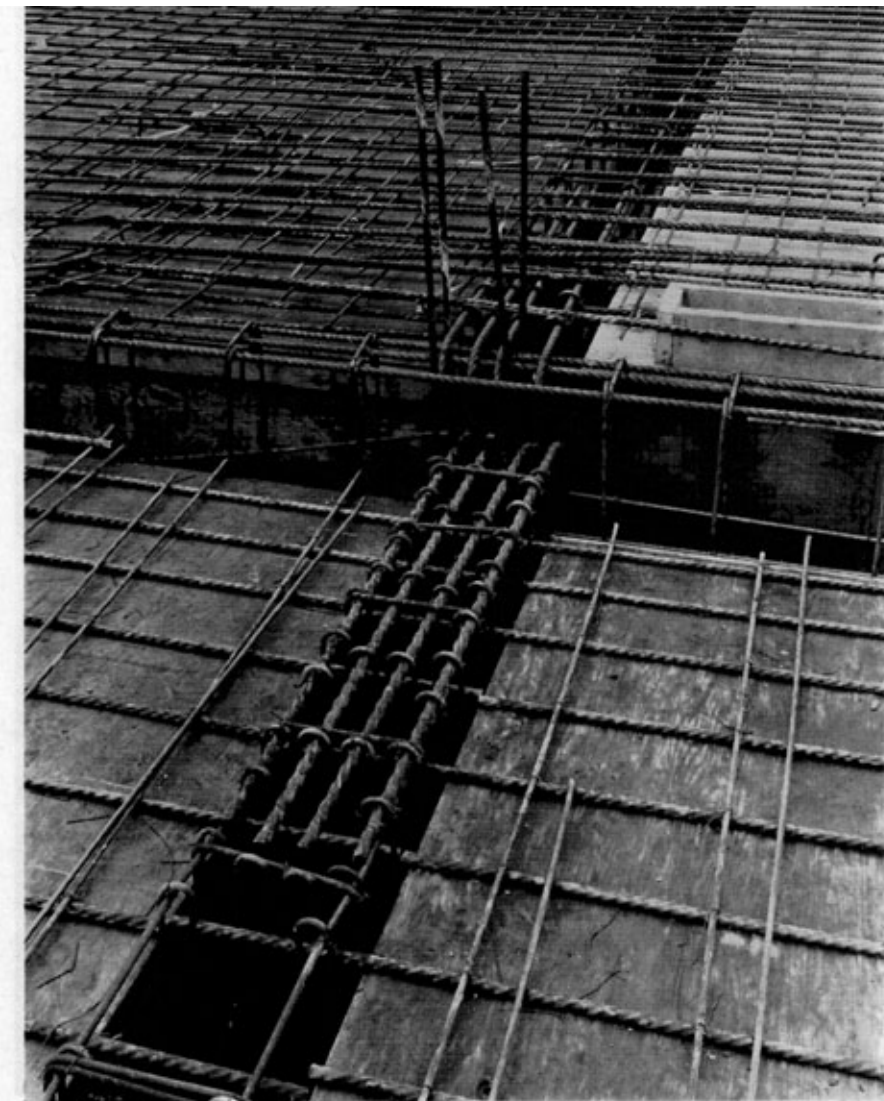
J. Sainsbury Coventry Store computer detailed reinforcement for main floor
